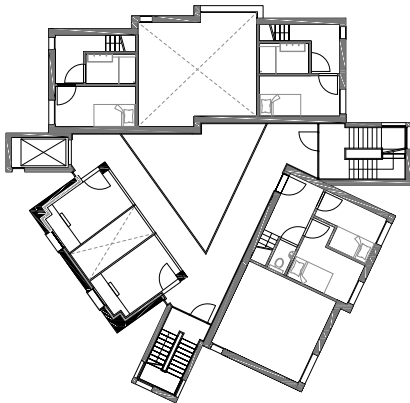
First floor, scaled to fit - offices, type C apartment, type B apartments
